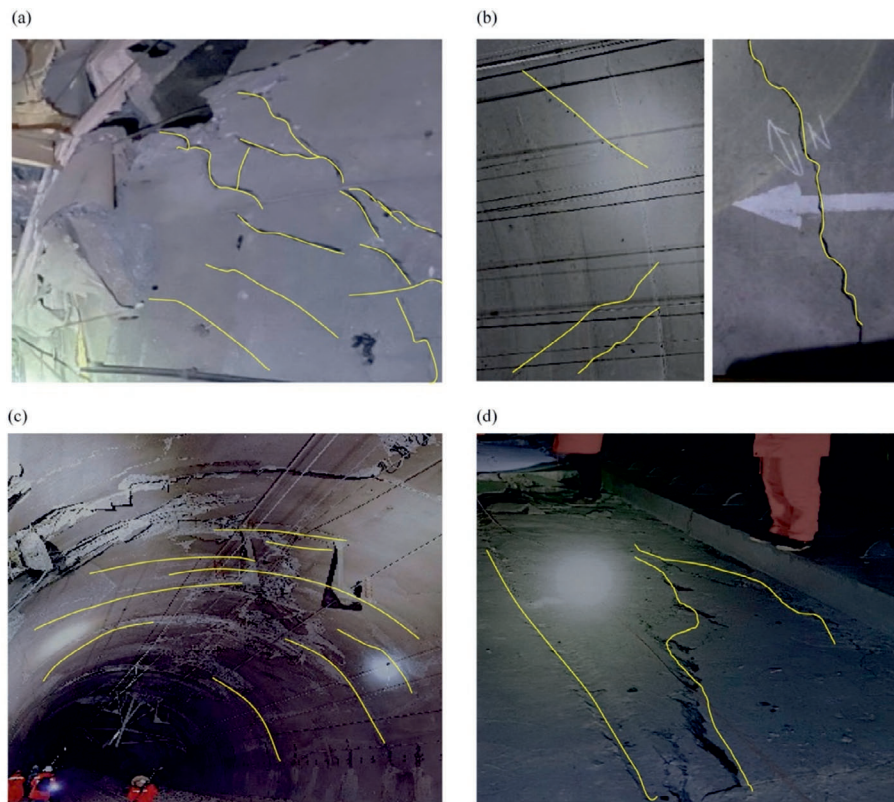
Four types of cracks. (a) Reticular cracks, (b) inclined cracks, (c) circumferential cracks, and (d) longitudinal cracks.
